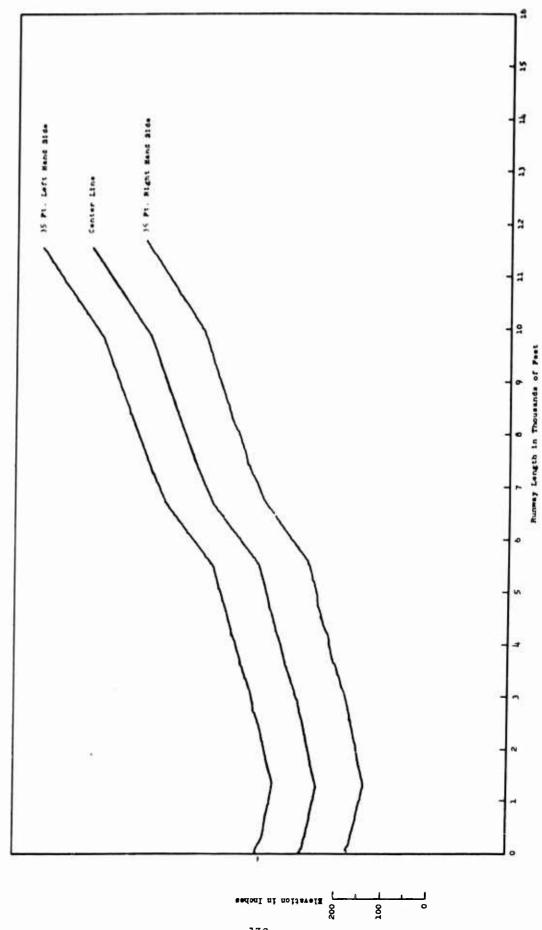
Profiles, Taxiway B, Falmdale Air Force Plant NR42
